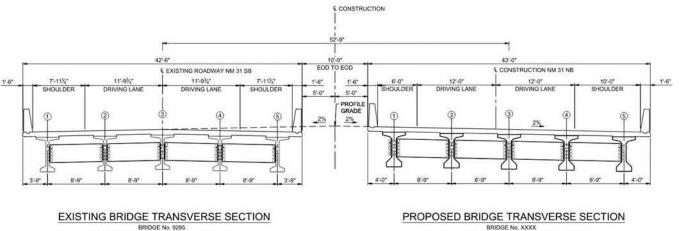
Proposed Bridge Layout Relative to Existing Bridge No. 9285
